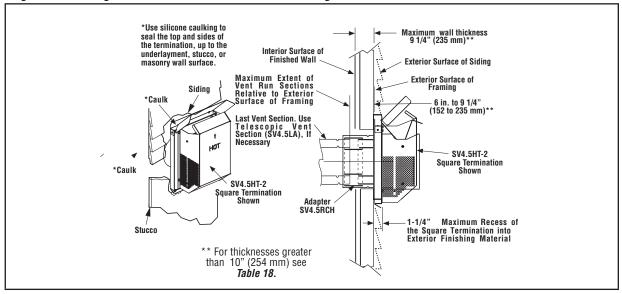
Venting Connection and Exterior Wall Recessing of the Horizontal Termination
